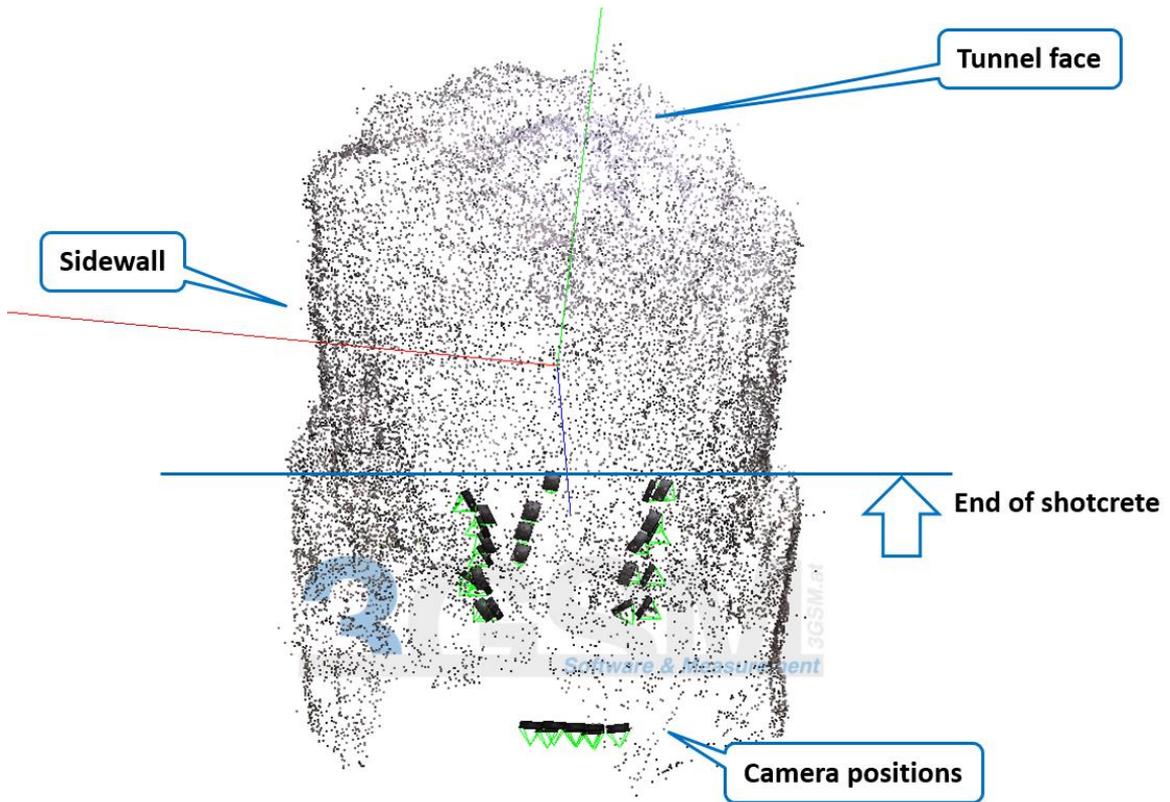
Exemplary setups of camera positions relative to a tunnel face
